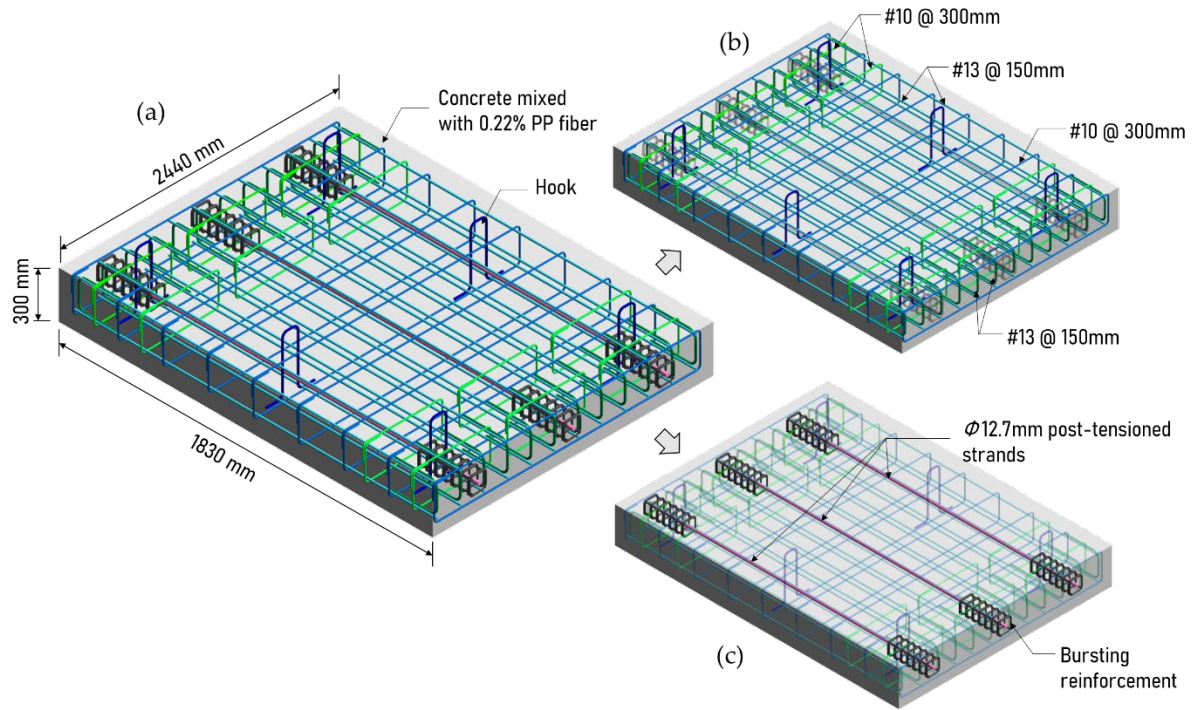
(a) Dimension, (b) reinforcement, and (c) unbonded prestressing details of TS 2
